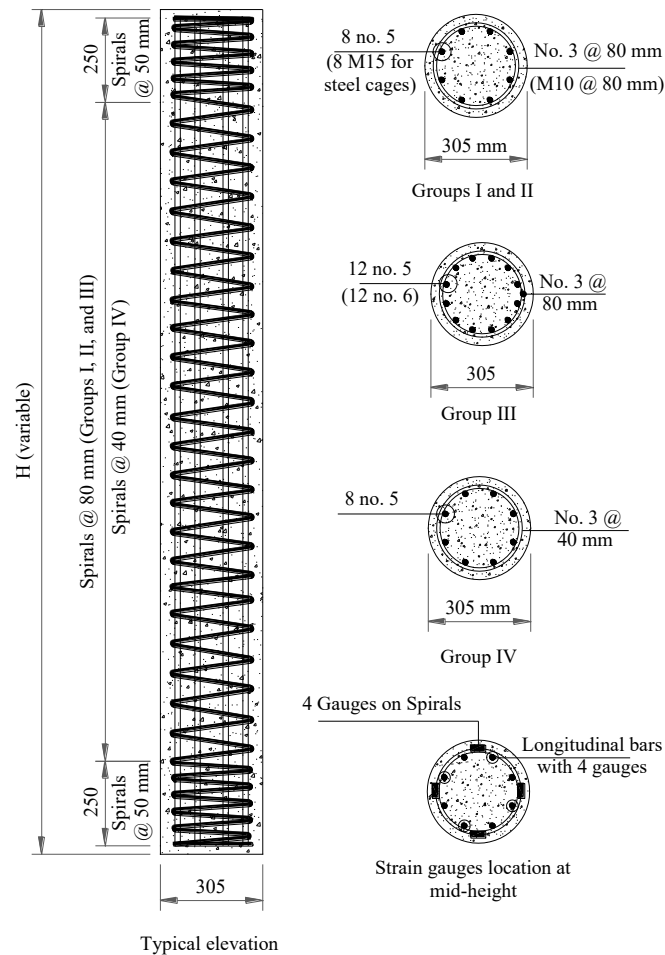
Typical layout, reinforcement details, and internal instrumentation.
